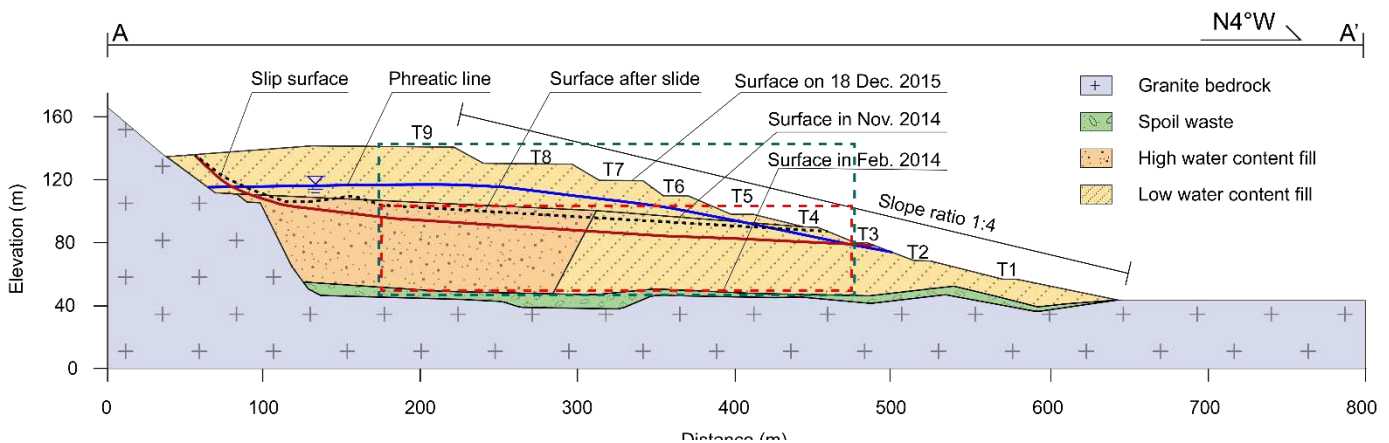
Typical geotechnical profile of the waste dump before failure (Zhan et al., 2018)
